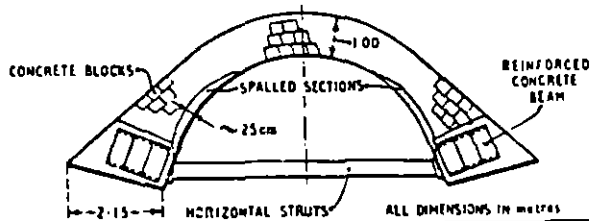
Roof-arch failure in a clayey-mylonite section of the new Semmering tunnel. The masonry consists of shaped concrete bricks, and high early-strength cement was used for these and for the reinforced-concrete beams
